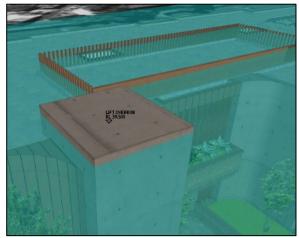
Proposed height of building exceedance (height plane shown in blue)
